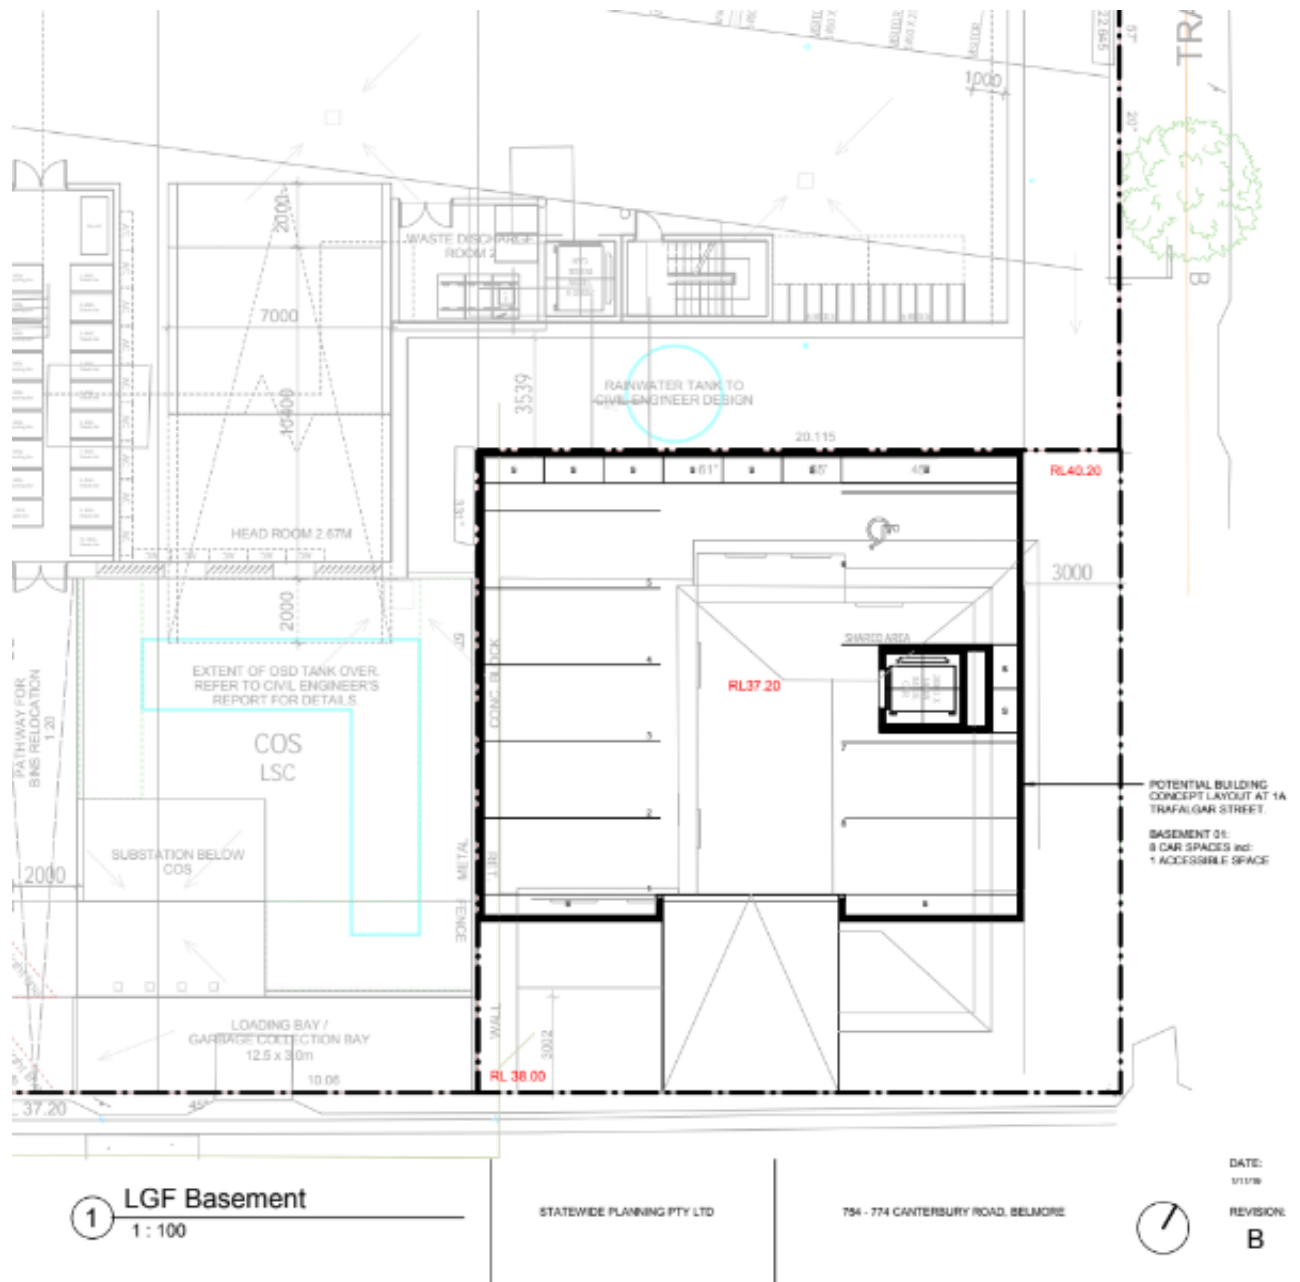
| Concept building layout of Basement for 1A Trafalgar Street.
